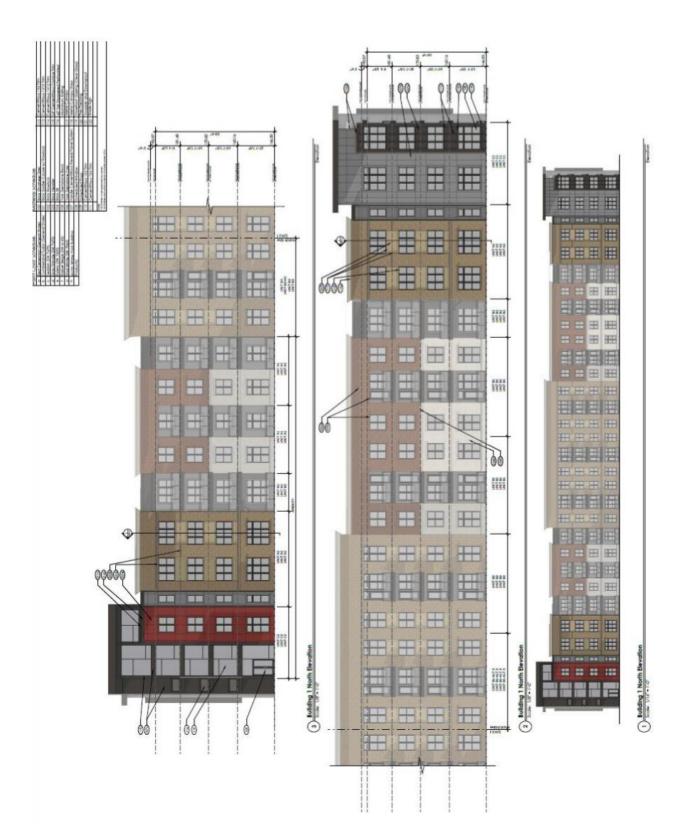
EXHIBIT D Conceptual Building Elevations – April 2, 2020
